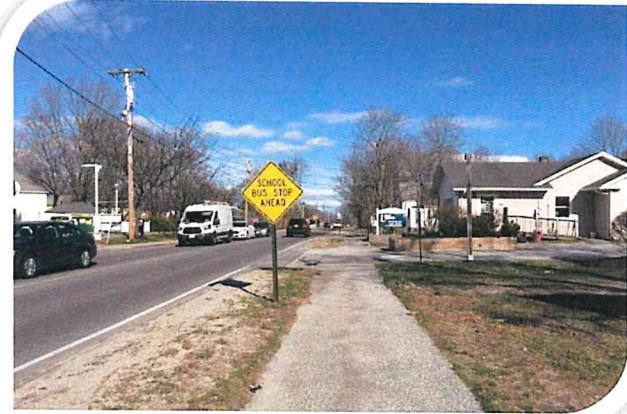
Segment 2 – New Portland Road from Tink Drive to Main Street
